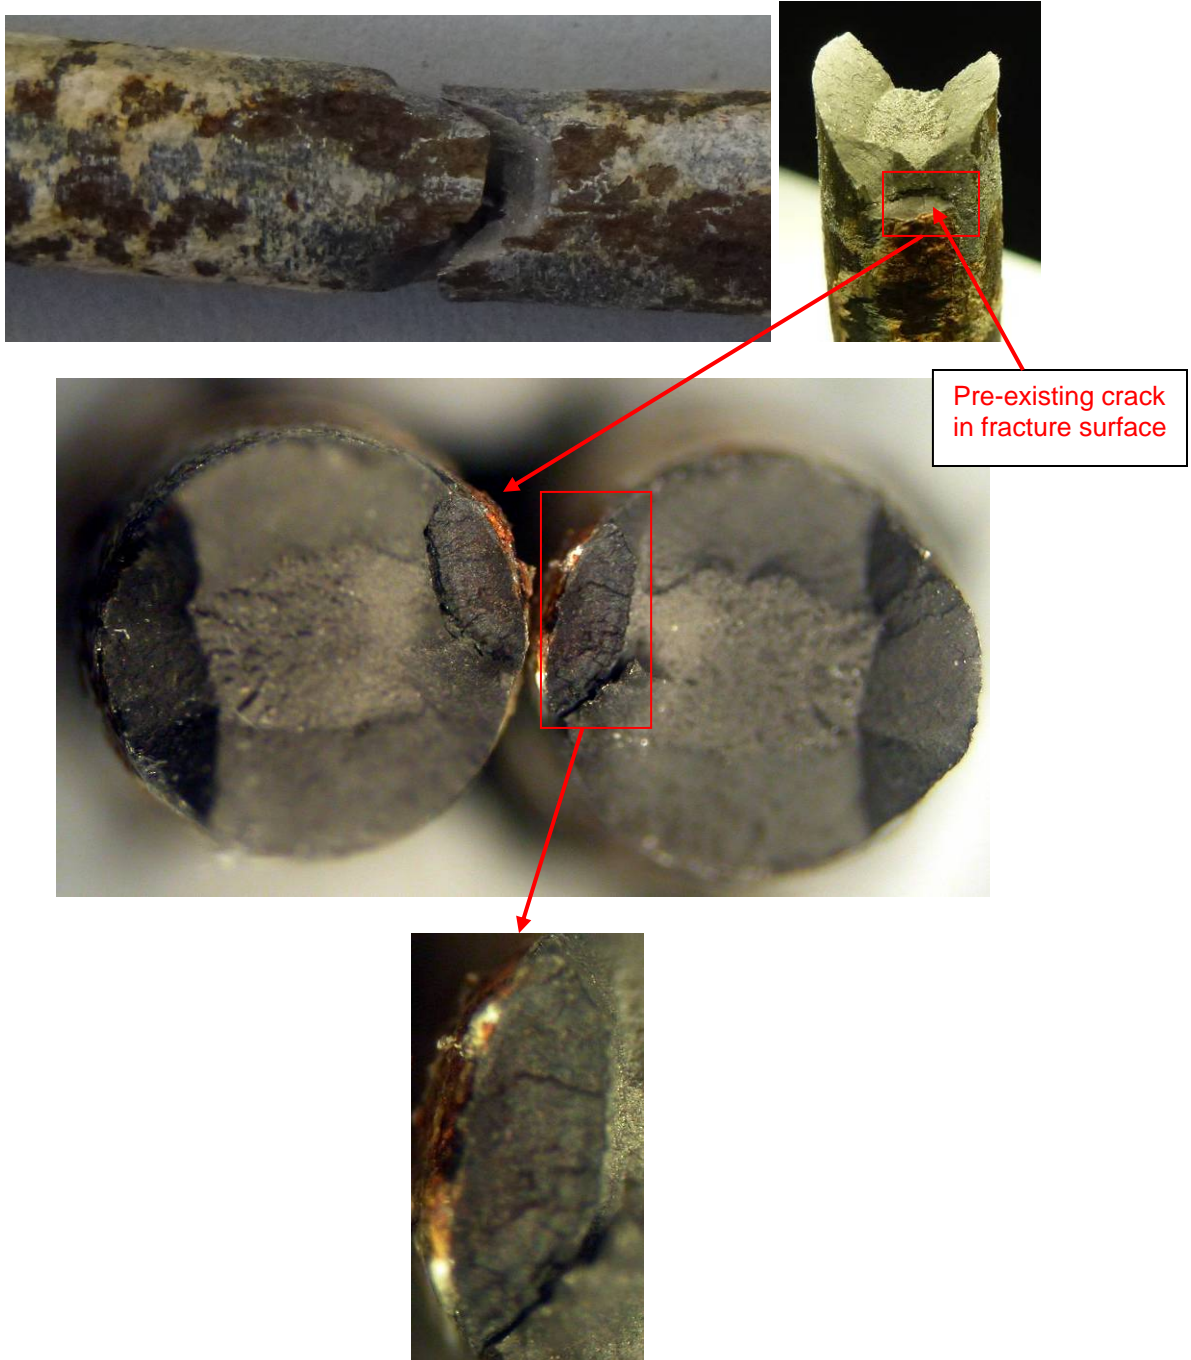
Wire 3-3 fracture profile (top) and fracture surface (bottom).
